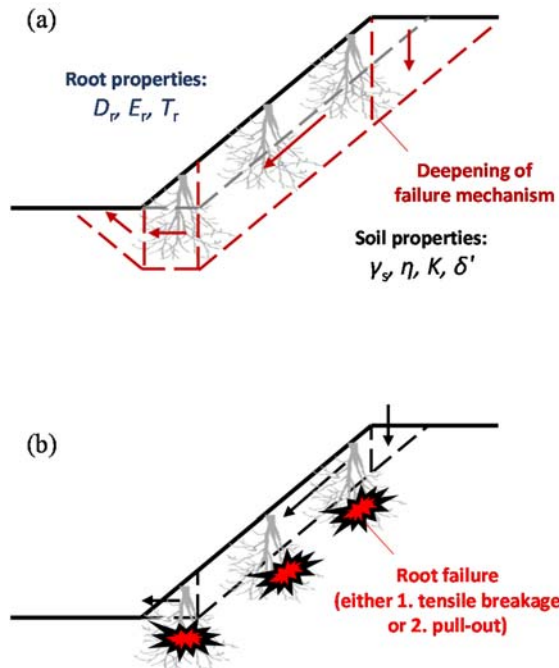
Failure mechanisms of a vegetation-reinforced slope: (a) soil fails around rooted zone; (b) roots fail.
